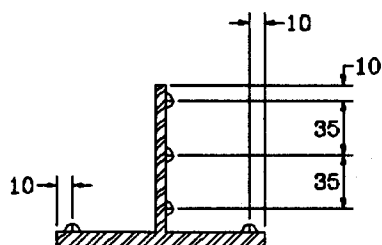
Location of rod-dial gauge assemblies for shrinkage test
